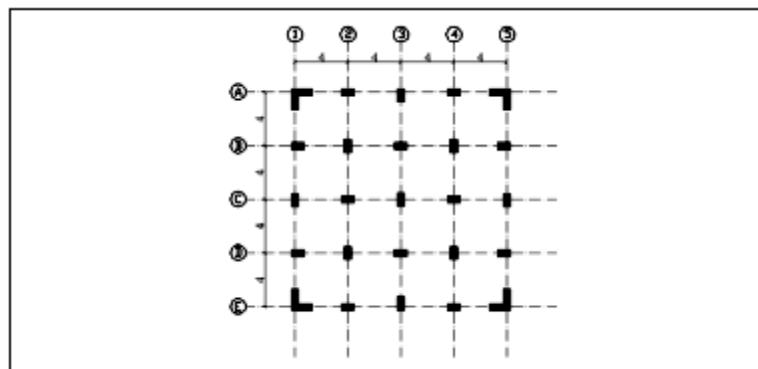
L-shaped Columns and Shear Walls on the Corners
